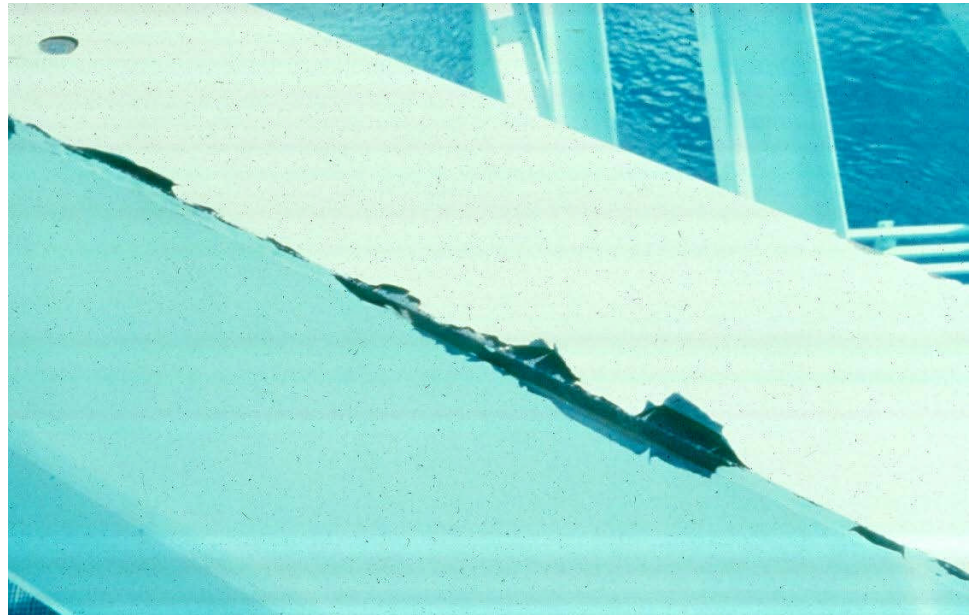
Paint Failure on Edge of Steel Truss Member
